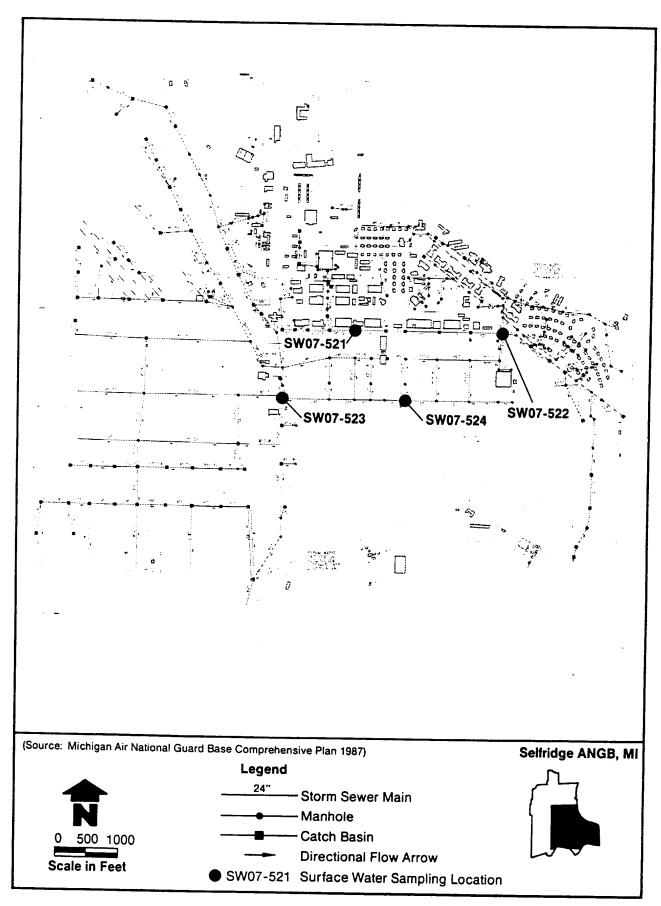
STORMWATER DRAINAGE SYSTEM IN THE EAST RAMP AREA
